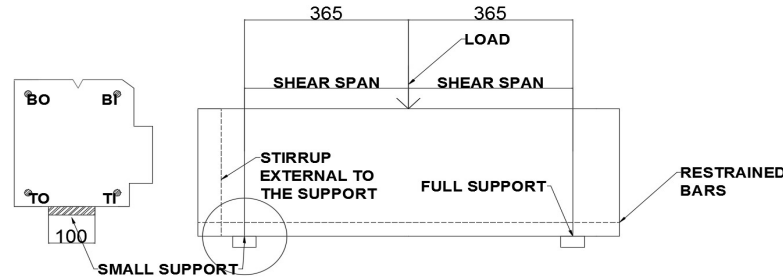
Directly supported 3-point bending test set-up. Dimensions in mm.
